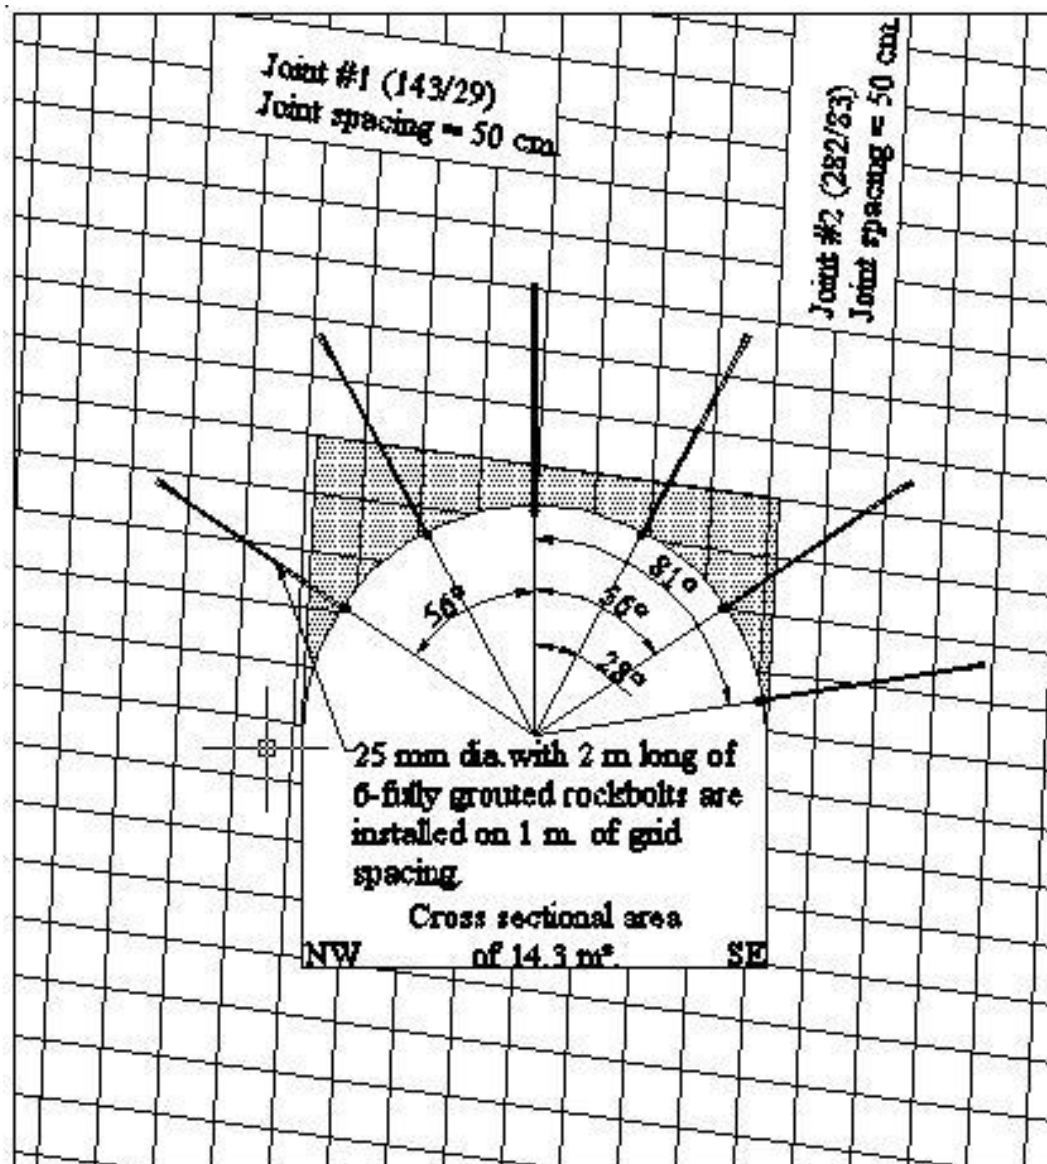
Preliminary layout of rockbolt in crosscuts in footwall limestone zone.
